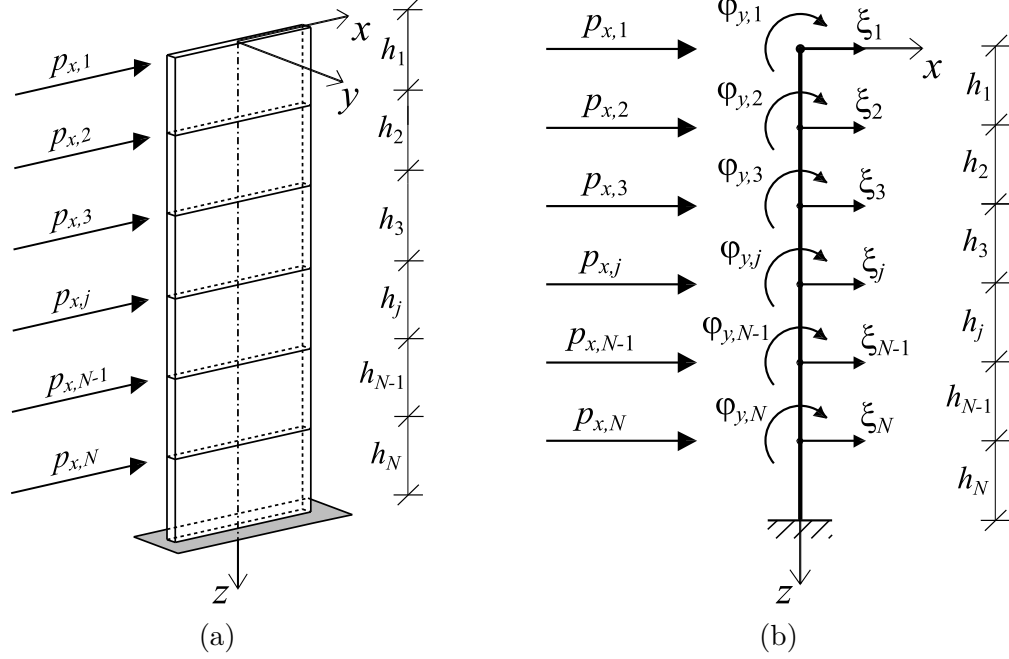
(a) 3D-model of a plane shear wall; (b) Projection of the shear wall on the plane  $xz$
